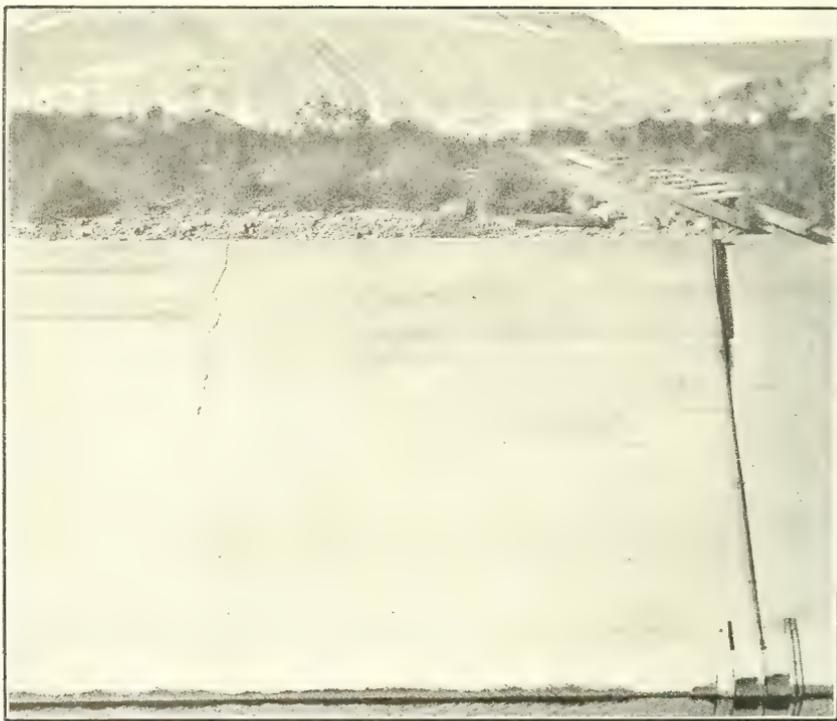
TYPICAL CRACK IN CONCRETE LINING, TRUCKEE-CARSON CANAL, NEV.
